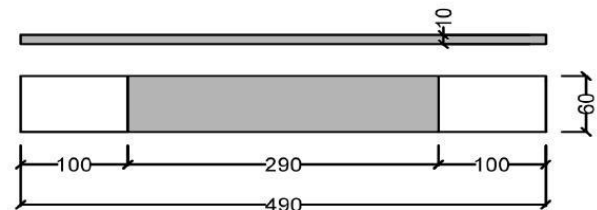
Geometry of the FRCM specimens (dimension in mm).
